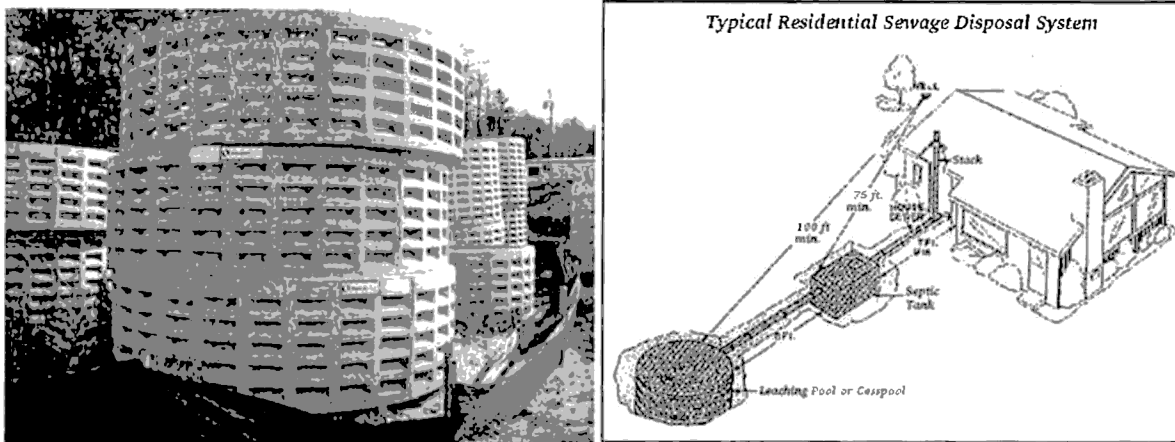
Precast Leaching Rings (Left) & Typical System layout (Right)
